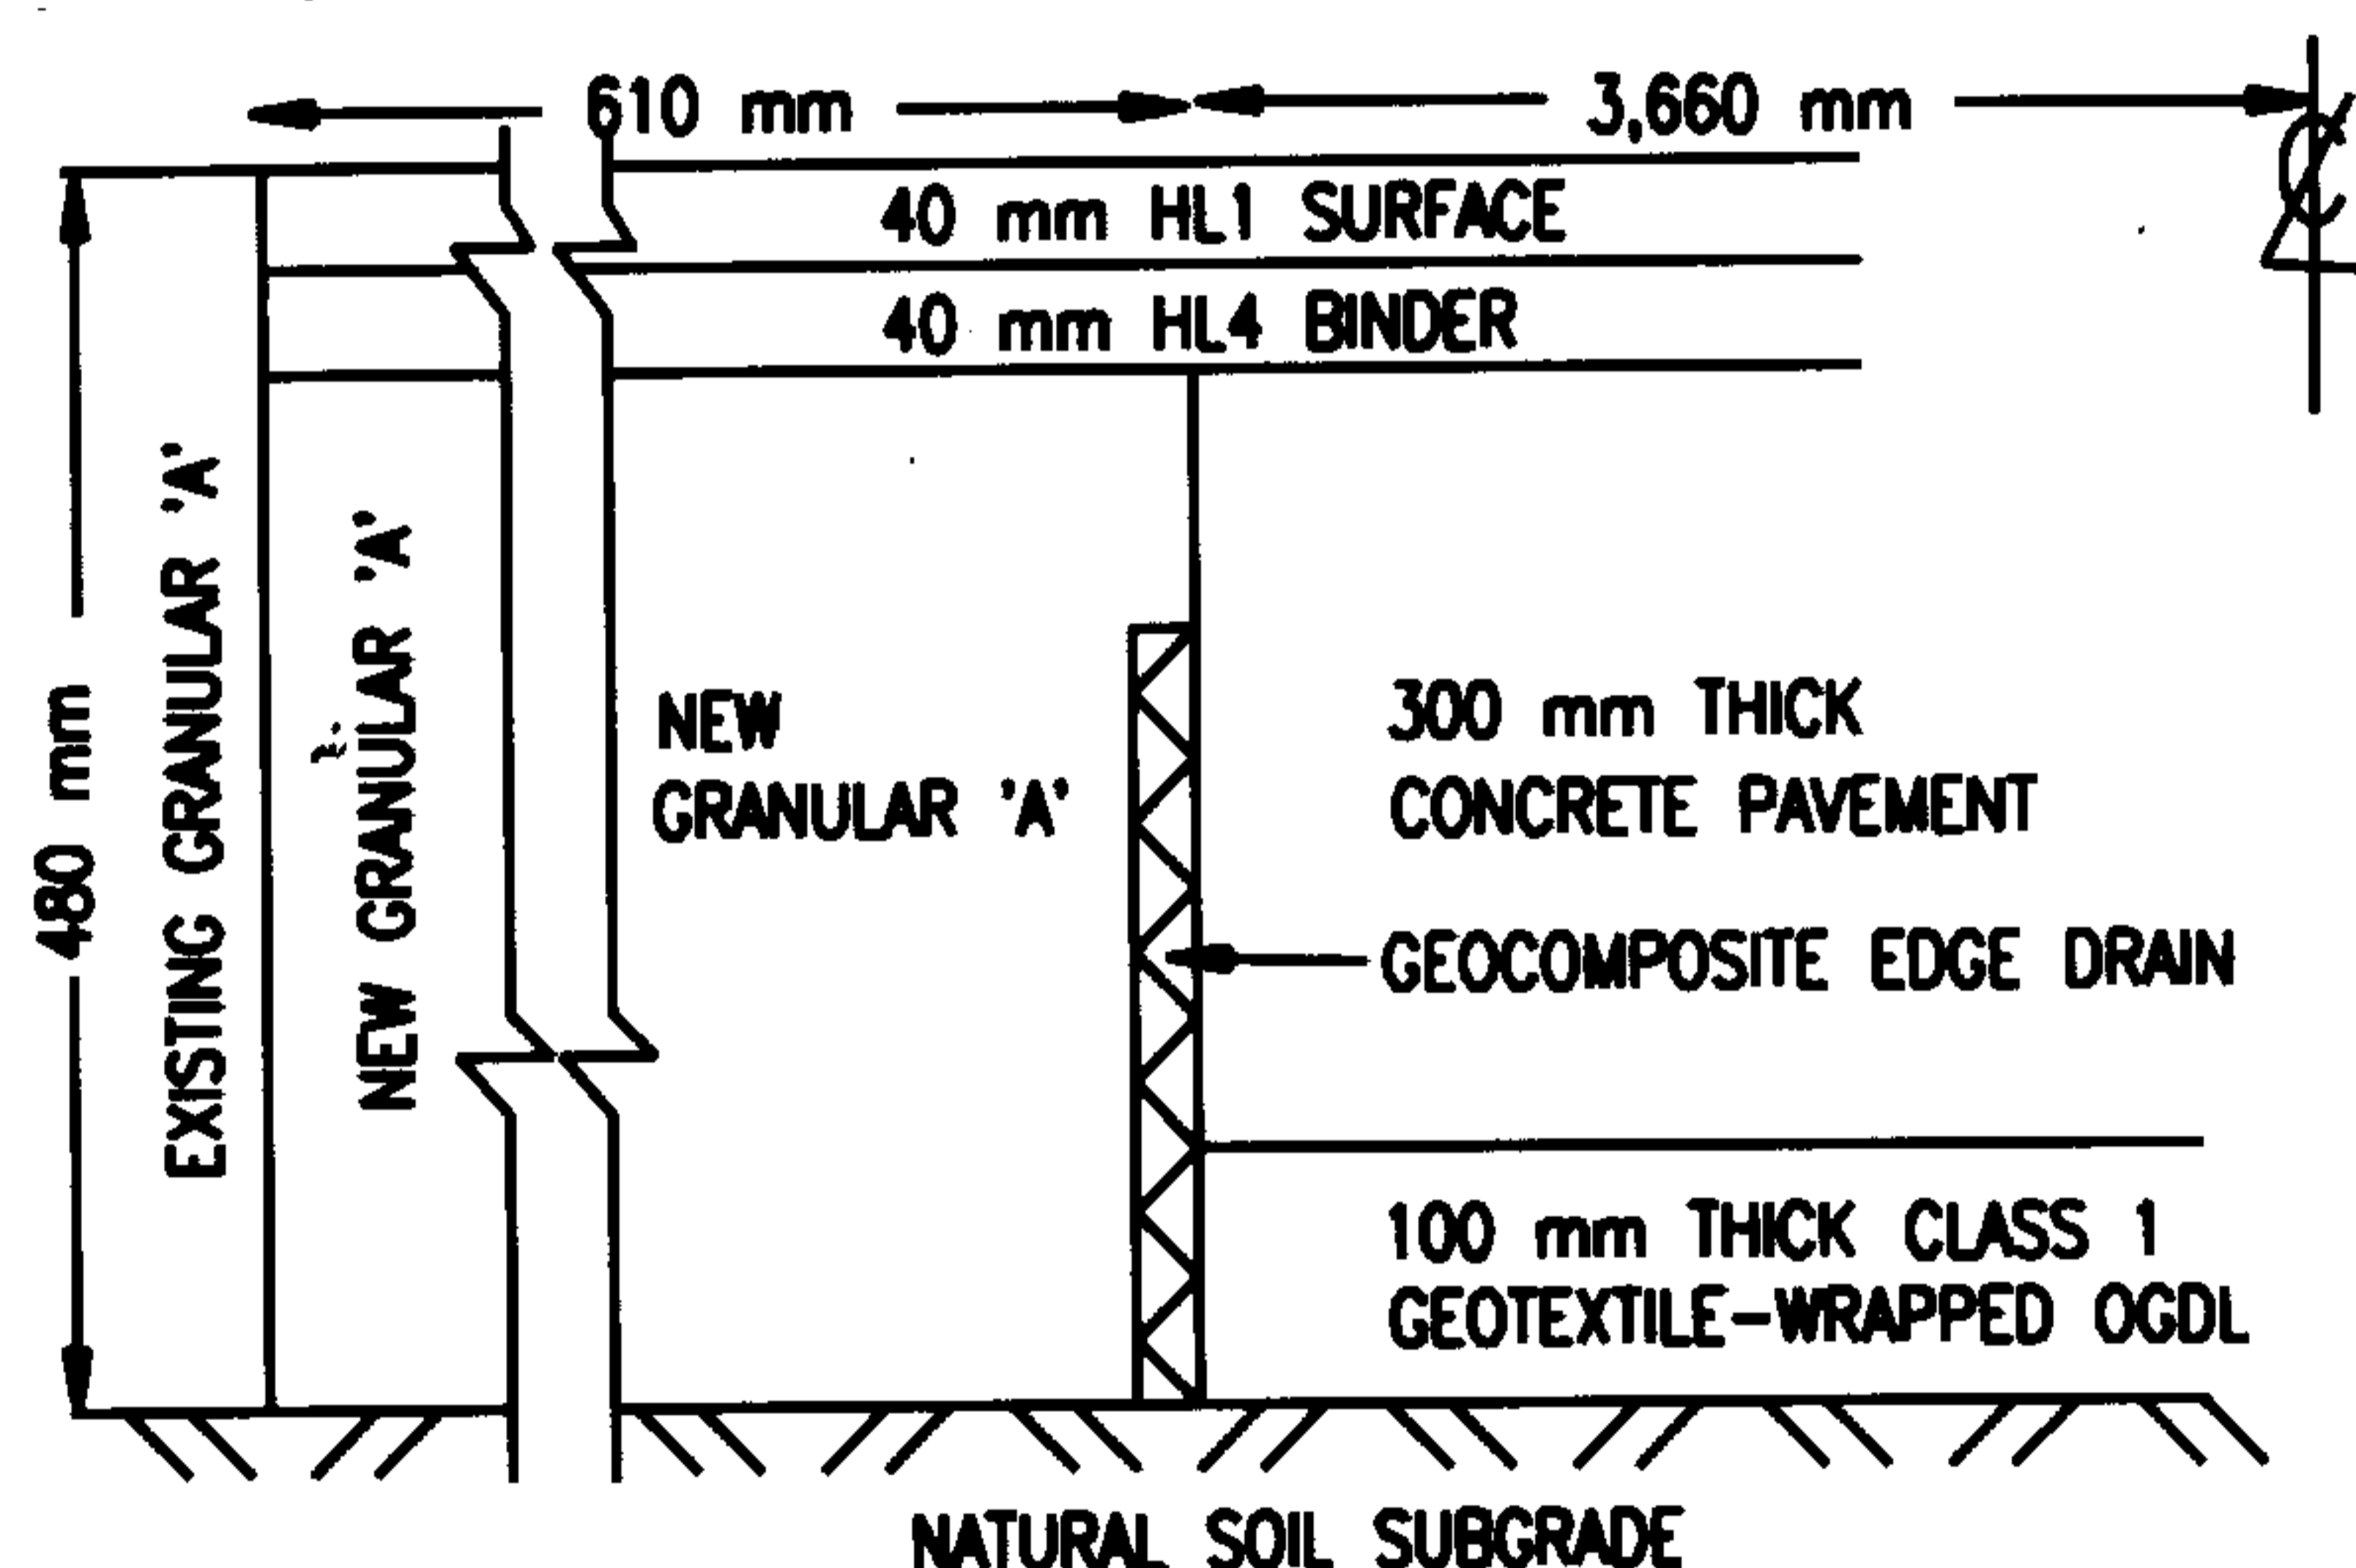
Cross section of Geocomposite Edge Drain installation as required from construction drawing.
